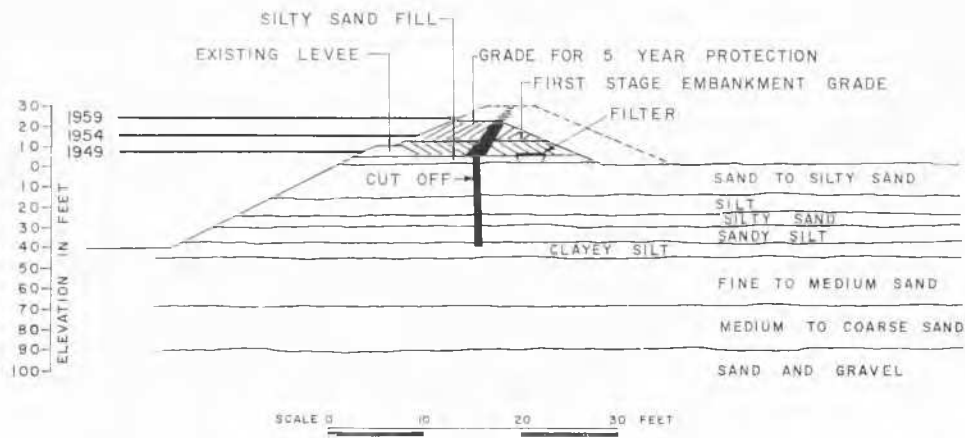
Typical section showing the cutoff wall and the stage construction of the levees.
